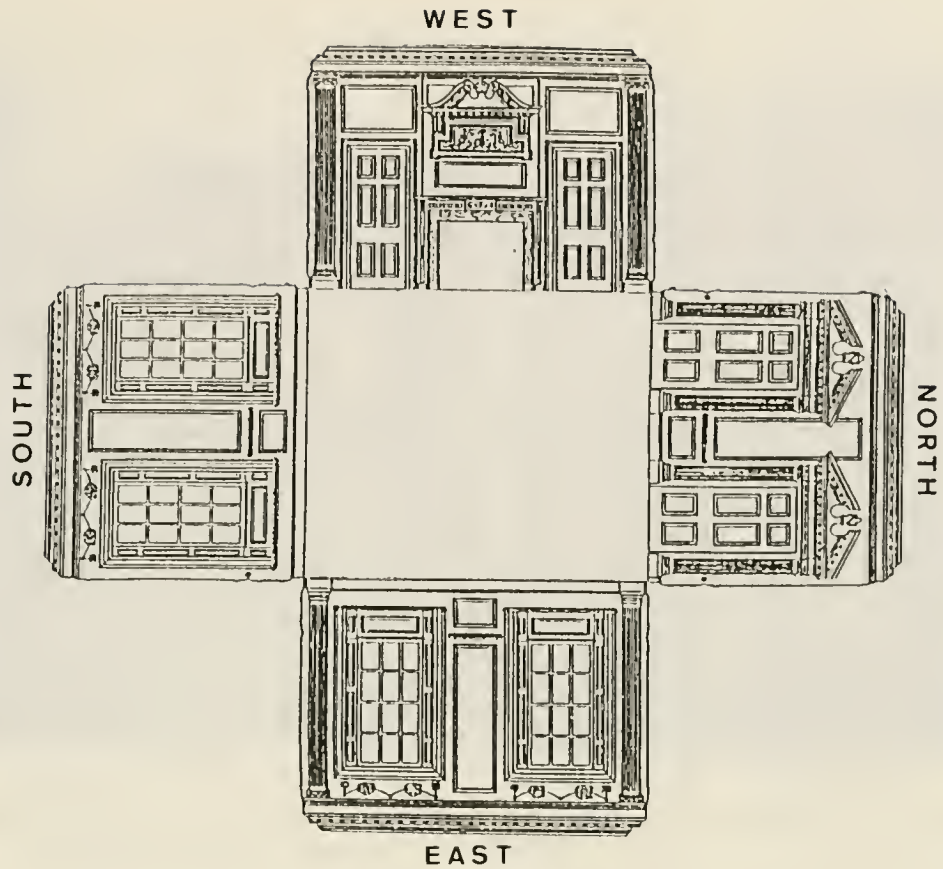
Wall elevations, Ionic drawing room, Drayton Hall, adjusted to reflect the conjectured original plan (RGF after drawings by Seel in Stoney)
